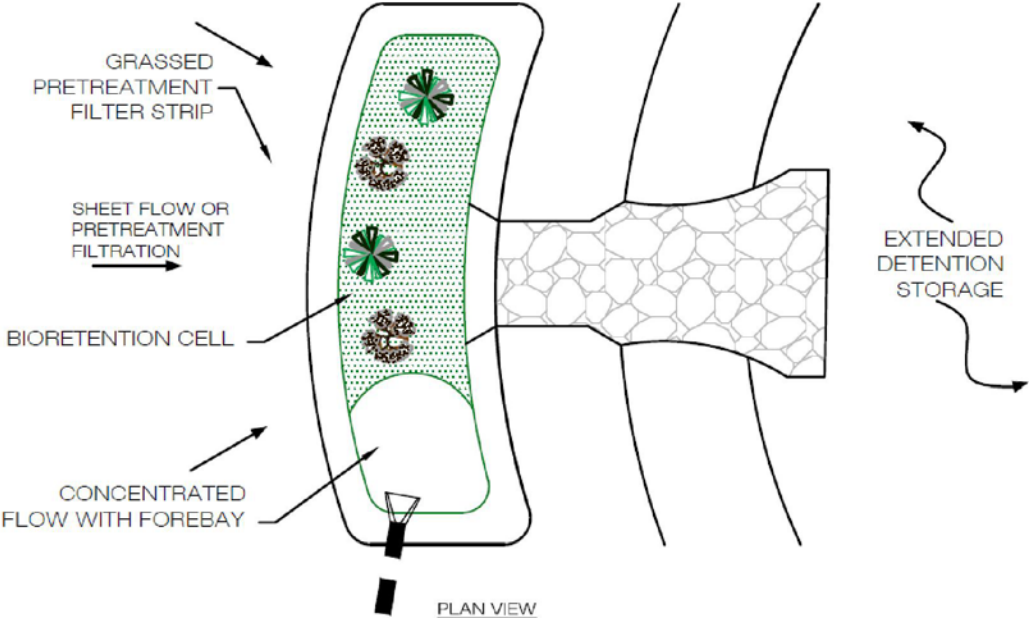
Typical Detail of Bioretention with Additional Surface Ponding (source: VADCR, 2010)
